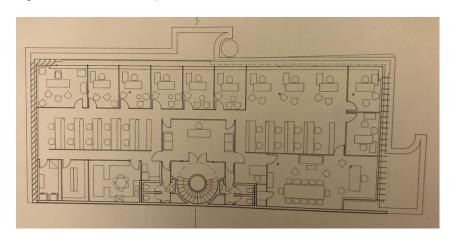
First floor plan. Drawn Ted Quinton 2006.
